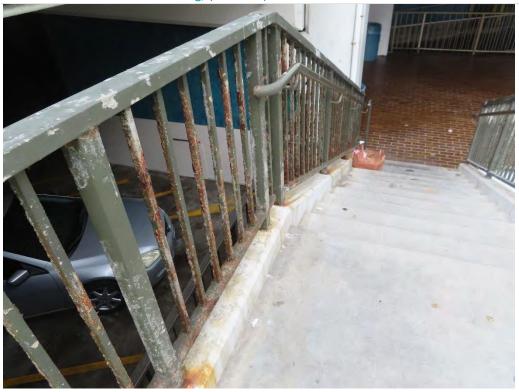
Corroded stair railing, (SH2-104)
